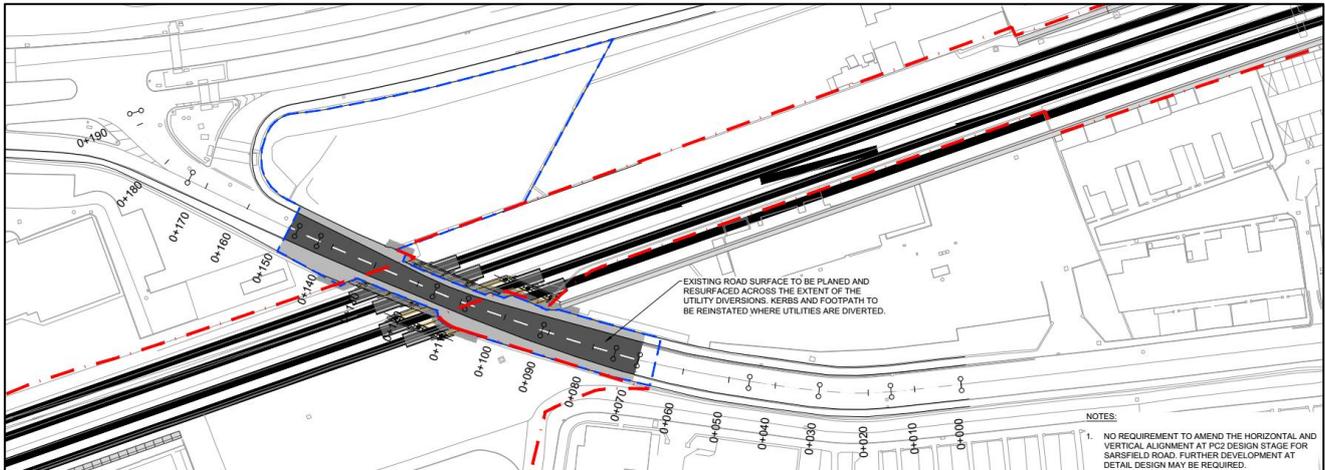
Sarsfield Road - Potential Area of Road and Footpath Resurfacing
